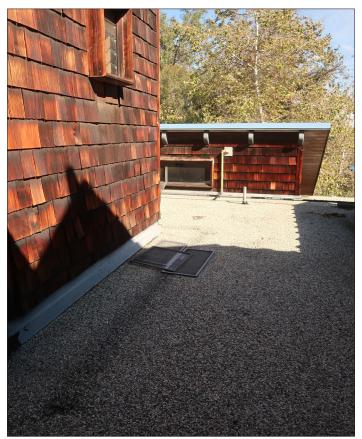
Detail of rafters at south balcony, view north (Chattel, 2022)
